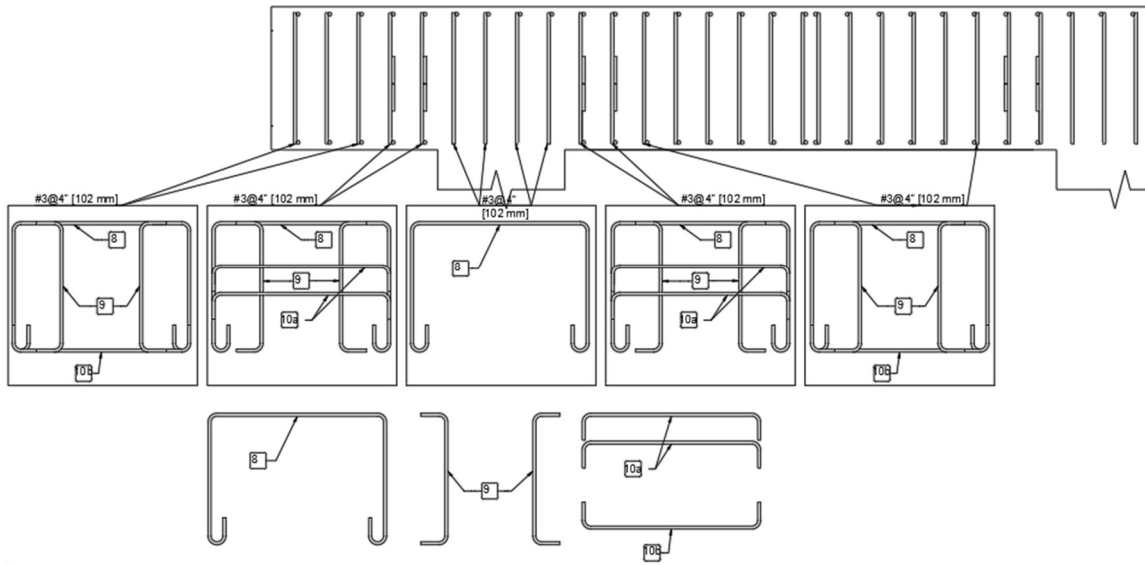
Elevation view of locations of cap beam transverse reinforcement cross-sections
